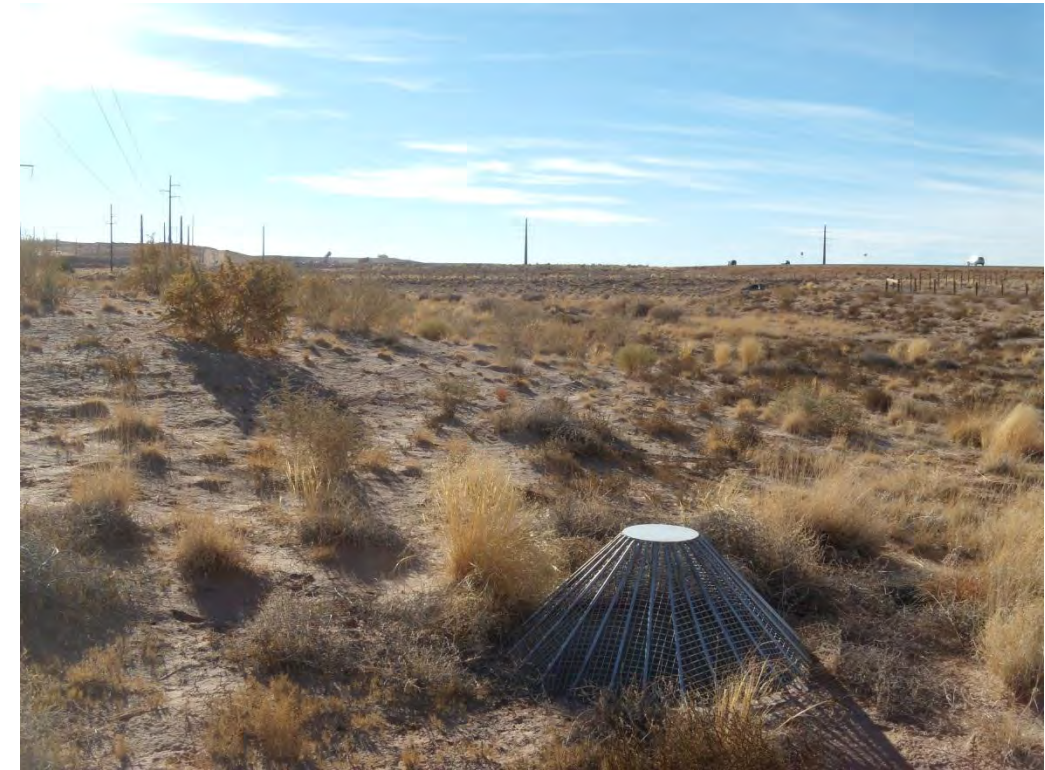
Pond # 13 (WC\_01P, capacity ≈ 3 AF), looking west from the outlet.
